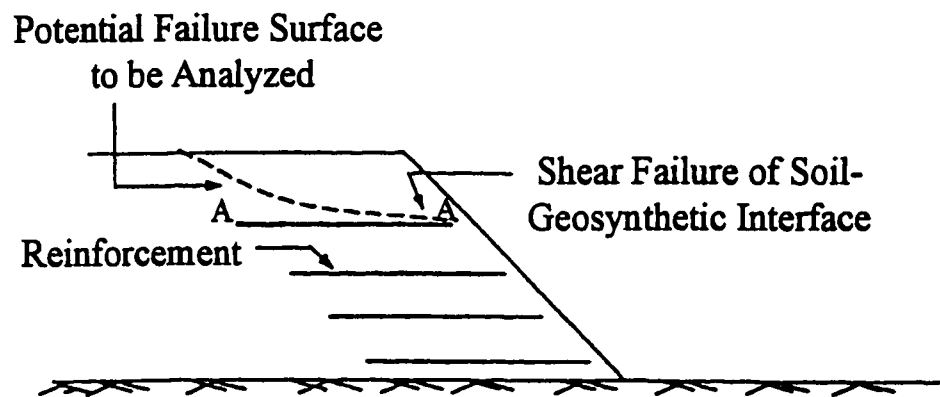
Shear failure mode in soil reinforcement application (Zhai et al., 1996)
